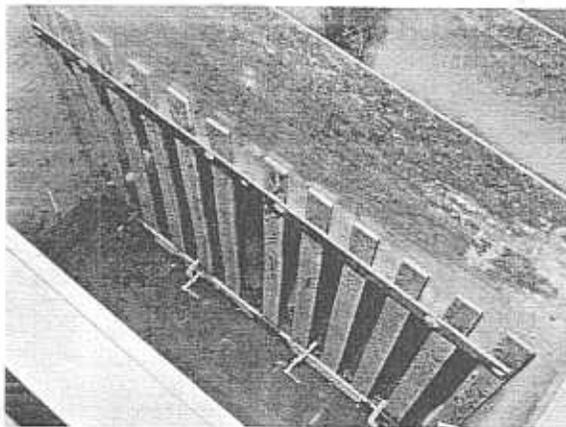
Recommended baffle arrangement. Photo PX-D-71976
